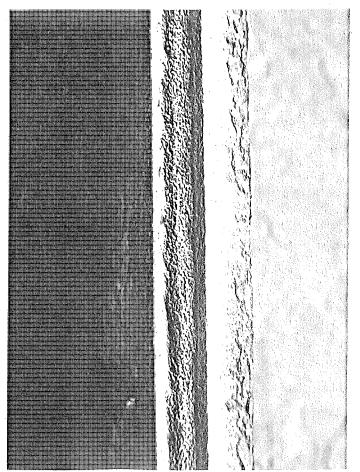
Wire-brushed fillet weld on a beam cover plate showing pitting after 14 years of service.
